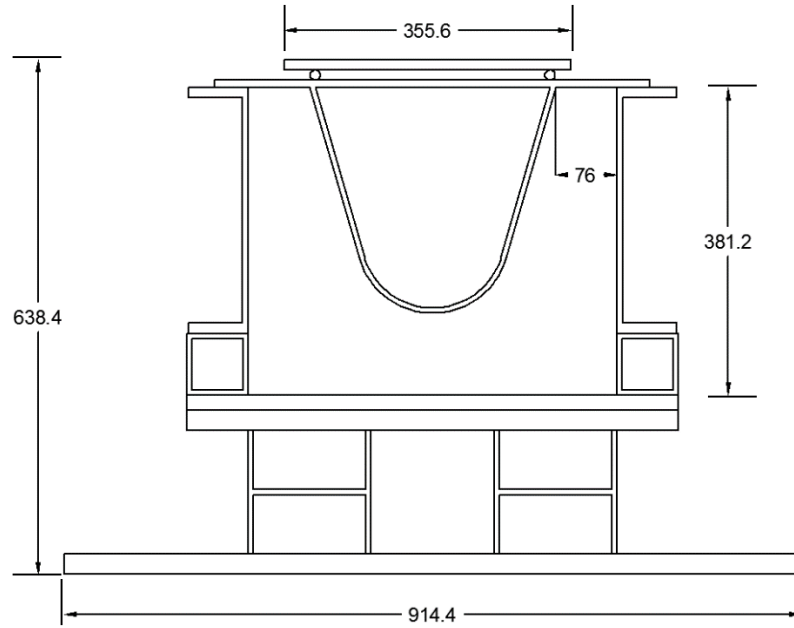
Test layout for type A specimen (all dimension in mm).
